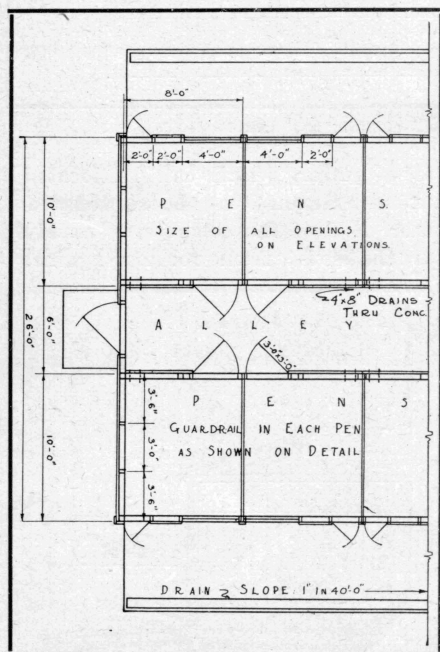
Floor plan for both half-monitor and gable-roof hog houses
